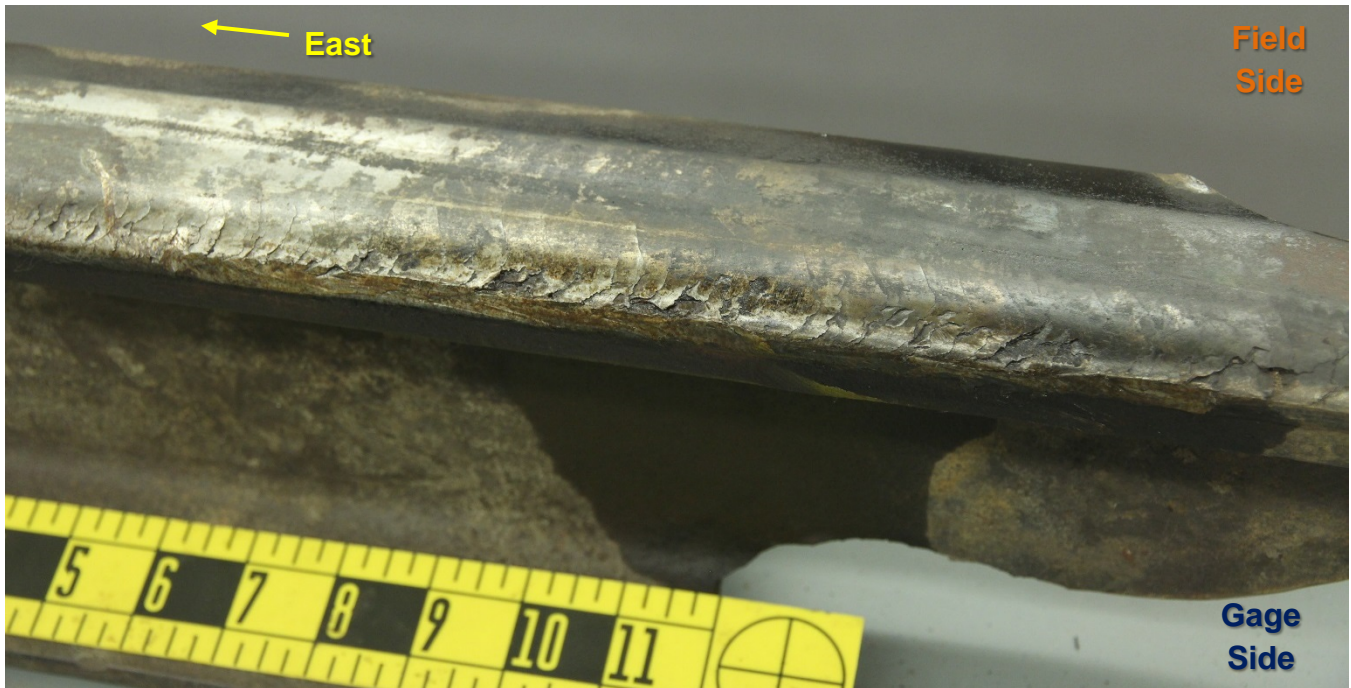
Closer view of head checking and shelling on the gage side of the 10S fragment.
